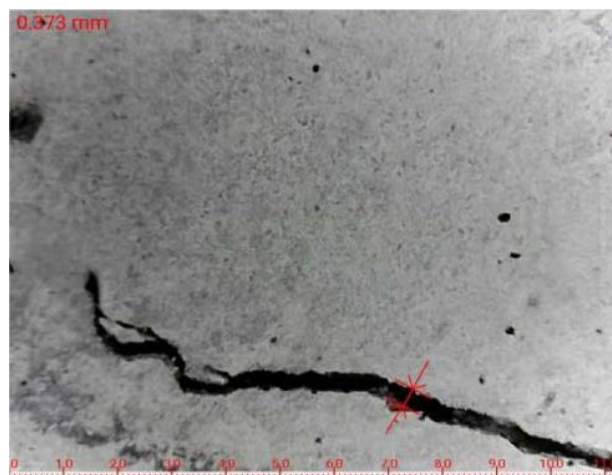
Maximum crack width of stairs under 62 kN pile load
